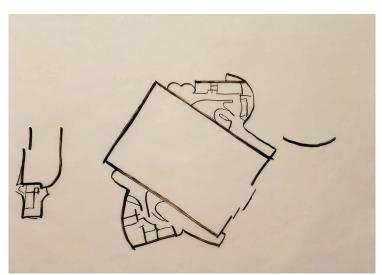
AUTHOER'S SKECTH OF SECOND FLOOR PLAN
